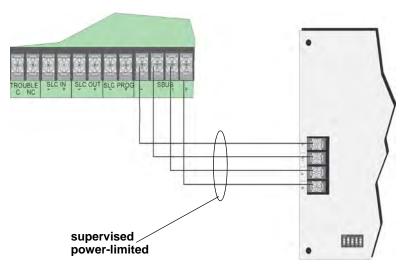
TR-5880 Connection to Main Control Panel Assembly
